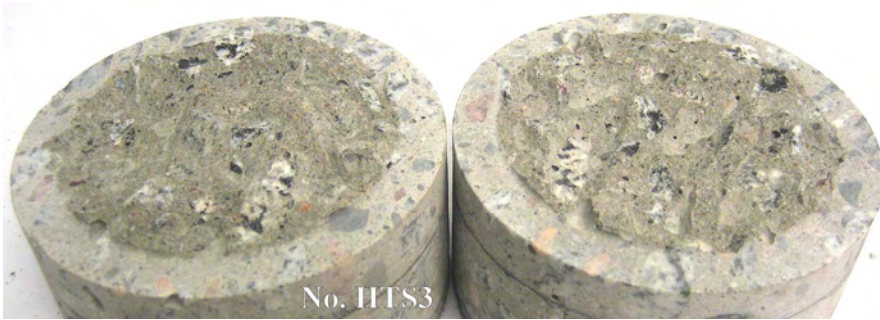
Photograph showing the failure surface for test No. HTS3 after tensile test.
